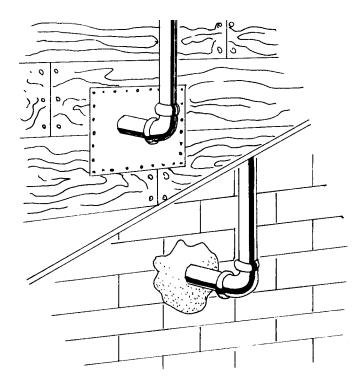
Seal gaps or holes with rodent-proof materials where pipes, wires, or other similar objects enter buildings.
